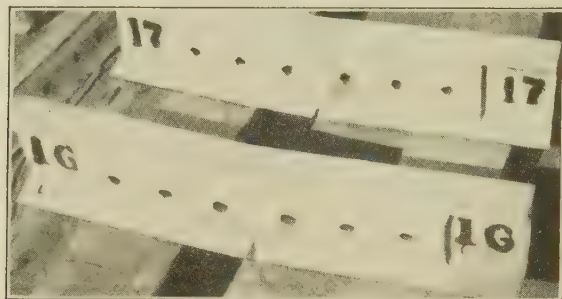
Fish-plate joints on 7-in. T-rail.
